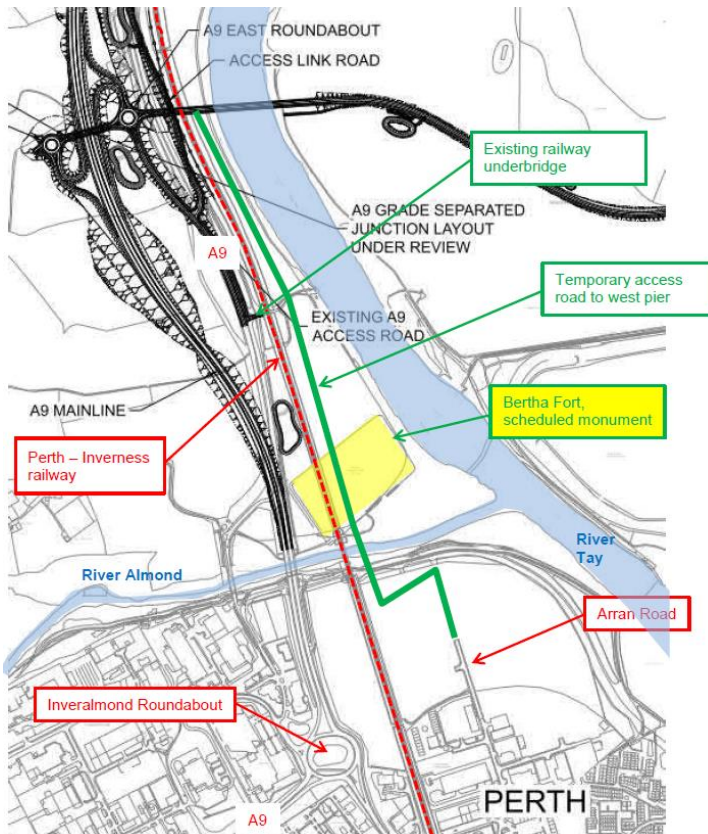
PROPOSED SOUTHERN HAUL ROAD
